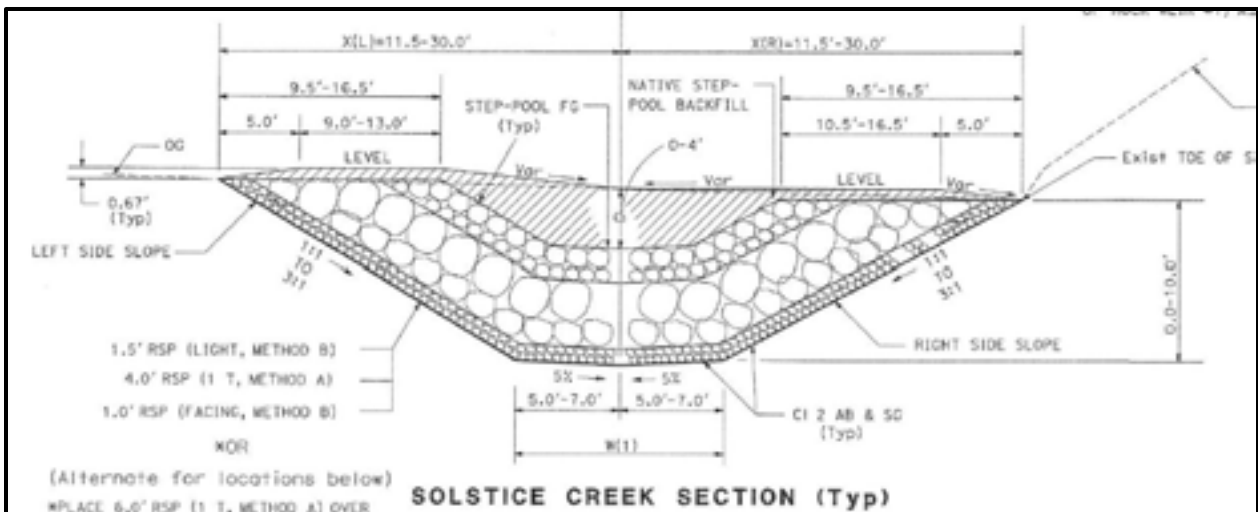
Typical cross-section in pool between downstream end of proposed rock-filled channel and downstream end of culvert. The rock weir is not shown in this cross-section.
